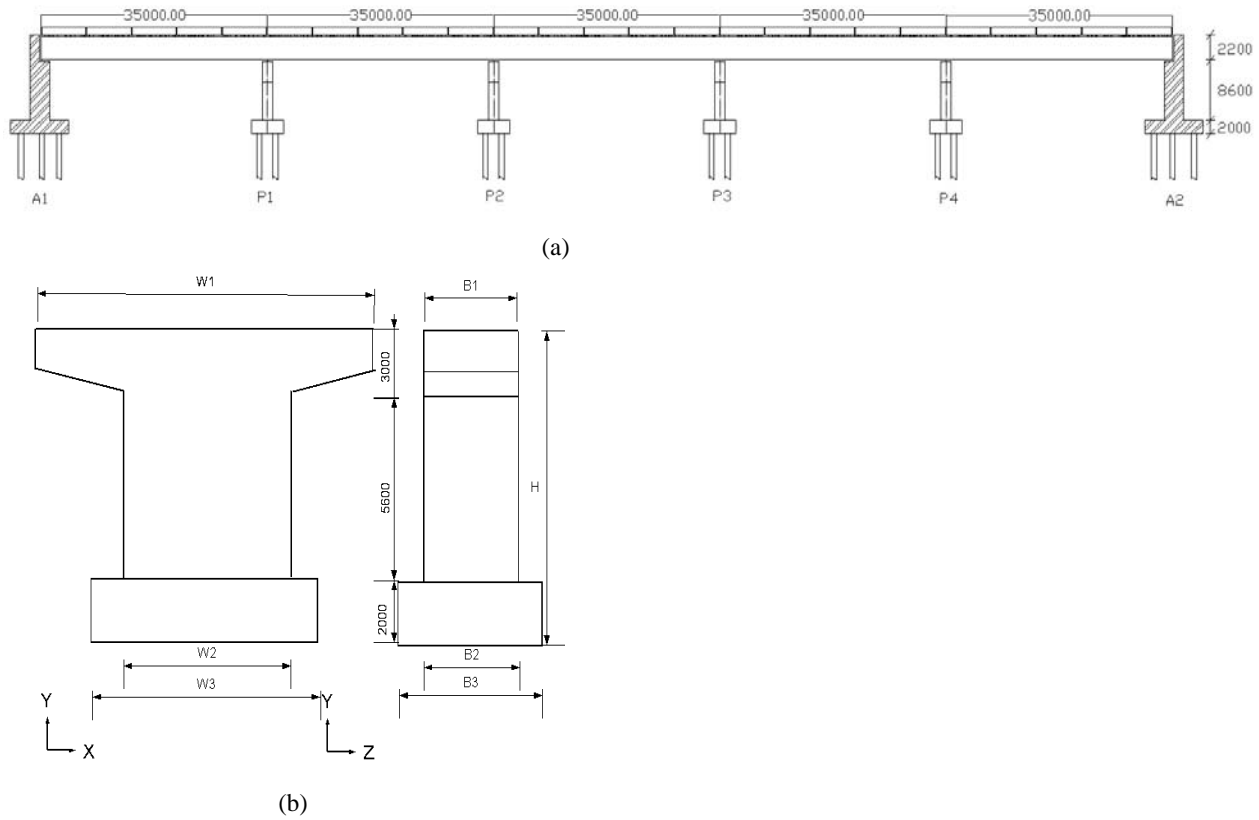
Physical model of a five-span continuous seismically isolated highway bridge (a) longitudinal sectional elevation of the bridge, and (b) transverse sectional elevation of the bridge; all dimensions are in [mm](Bhuiyan, 2009)
